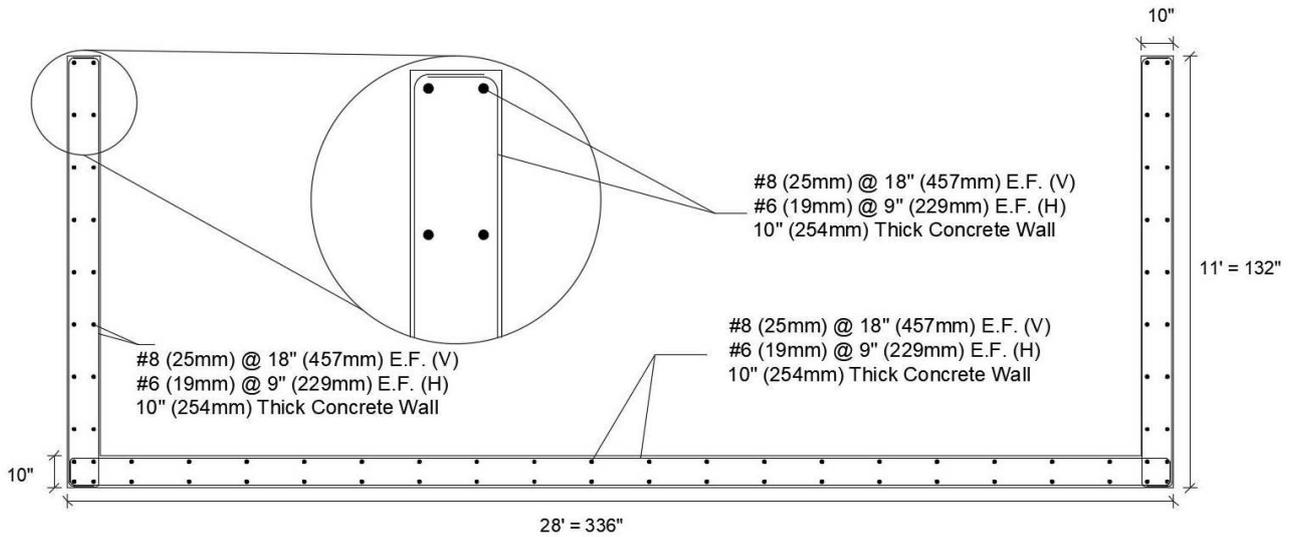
Original elevator shear wall cross-section at the ground floor level (1" = 25.4mm)
